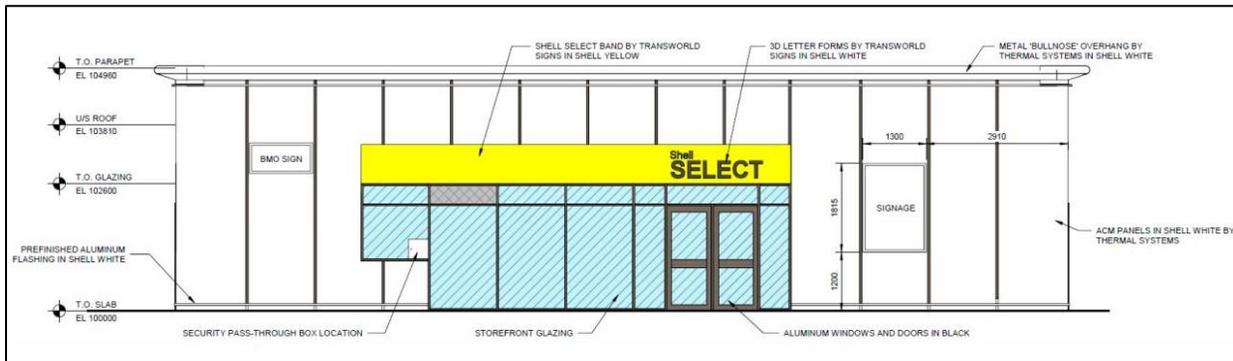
Conceptual gas bar/convenience store elevation – View looking north (shown as West Elevation on A201.1 dated November 16, 2018).
